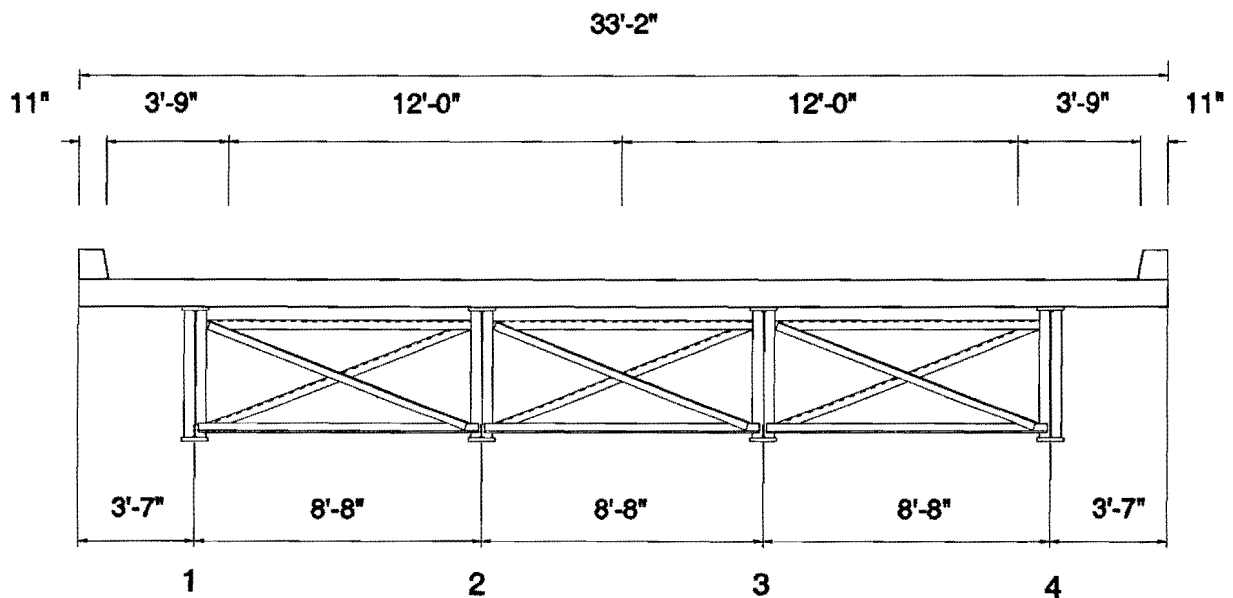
Typical bridge cross section prior to shoulder widening.
